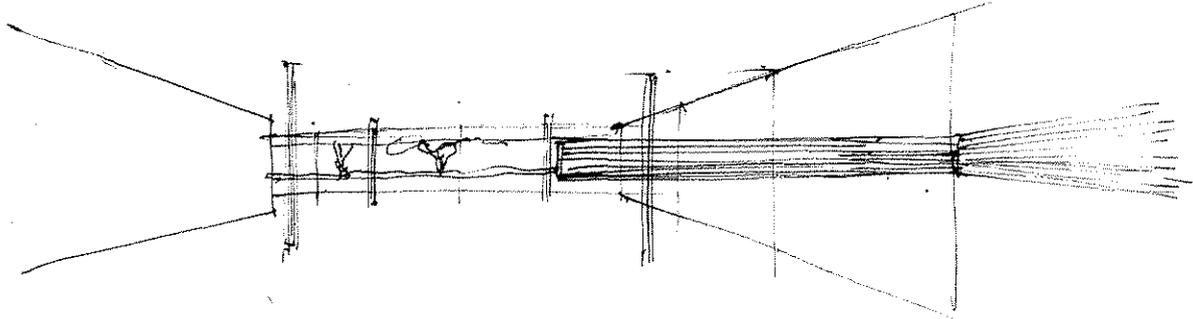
Mies van der Rohe, Ludwig: Hubbe house, 1935. Interior perspective and elevation sketches. Ink on tracing, 8 1/4" x 11 1/4". (Collection, Mies van der Rohe Archive, The Museum of Modern Art, New York. Gift of the architect).
